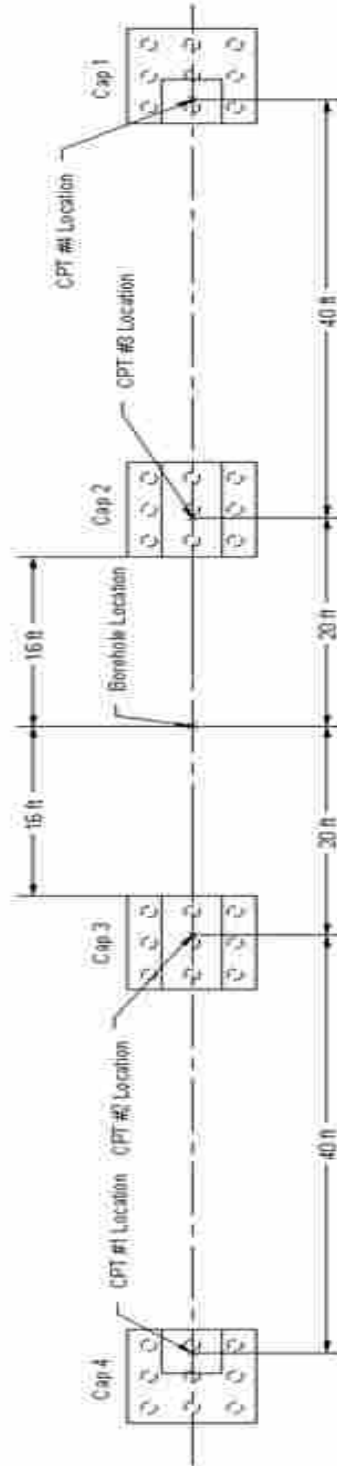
Plan view showing location of boring and cpt soundings relative to completed pile caps.
